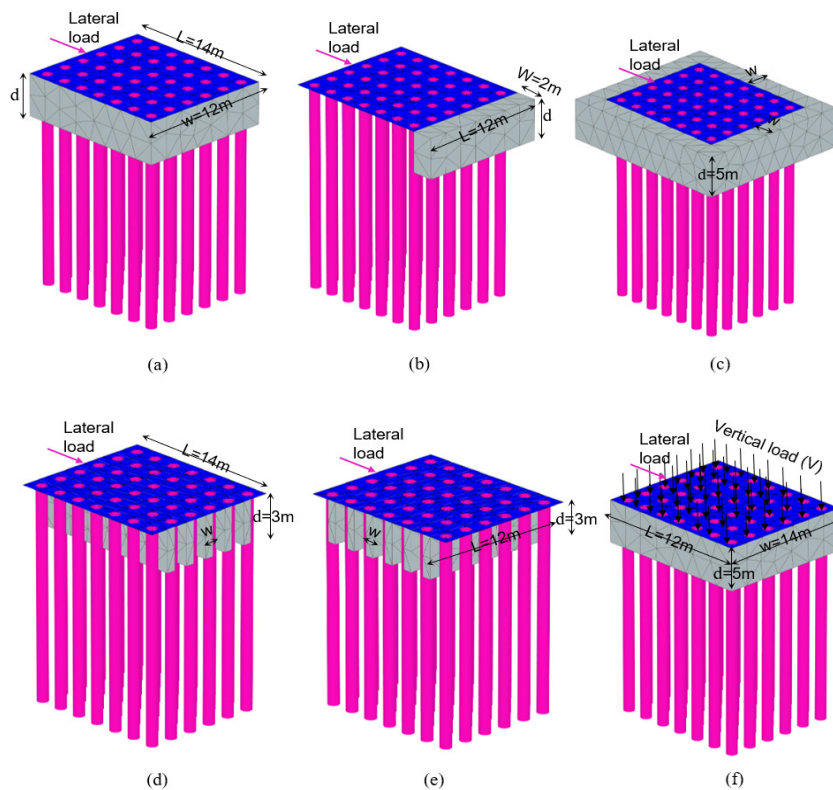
Different geometric parameters studied by PLAXIS 3D: (a) jet grout below the piled raft, (b) jet grout beside the piled raft, (c) jet grout below and around the piled raft, (d) jet grout strips parallel to lateral load, (e) jet grout strips perpendicular to lateral load, and (f) combined loads on the piled raft in grouted clay.
